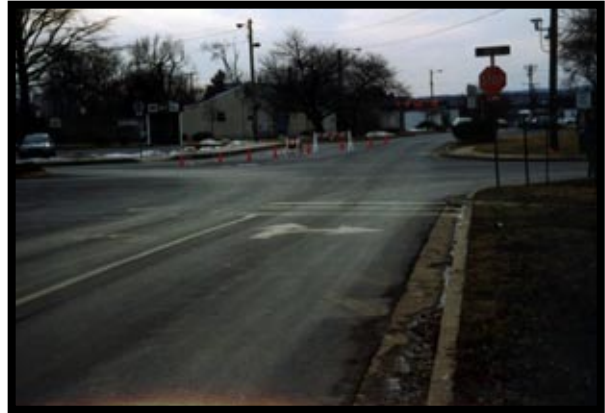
Intersection of Ditto Avenue and Porter Street (westward view).
